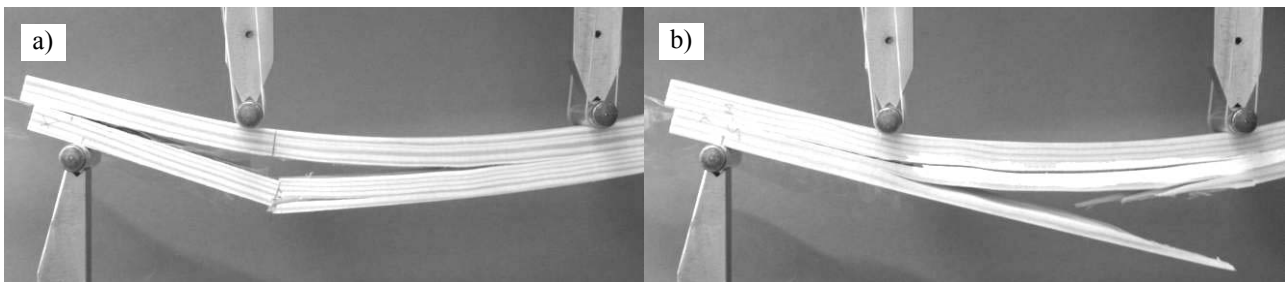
Tension failure of the lower beam arm (a) and cross-graining between the loading cylinders (b) for an unrepaired beam.
